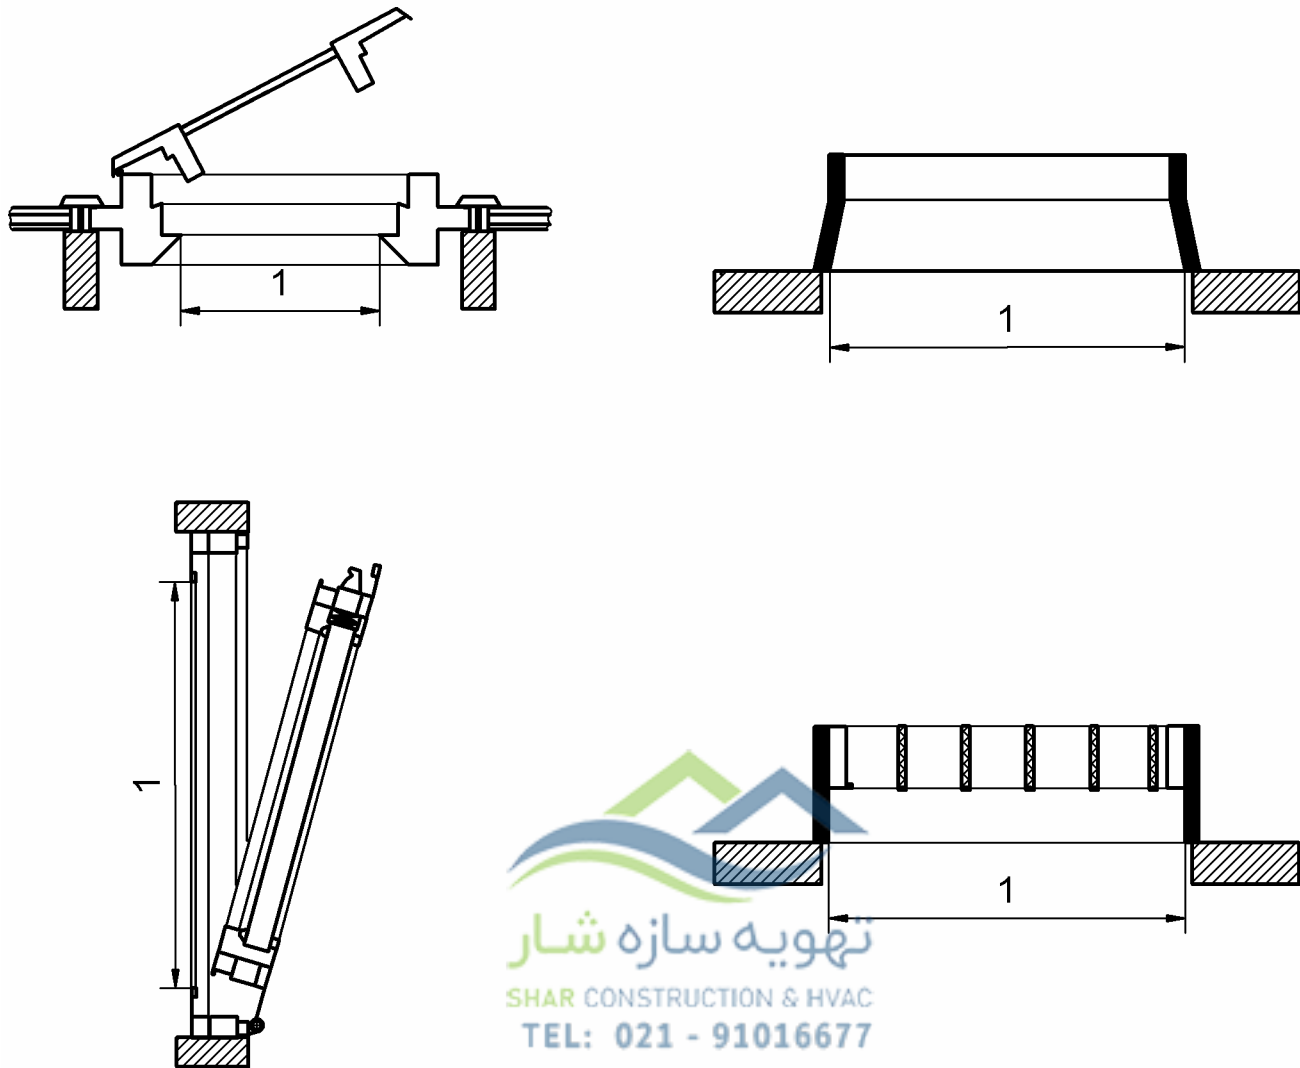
a) — Data for the mounting of roof mounted and wall mounted NSHEV opening to the outside onto the settling chamber
